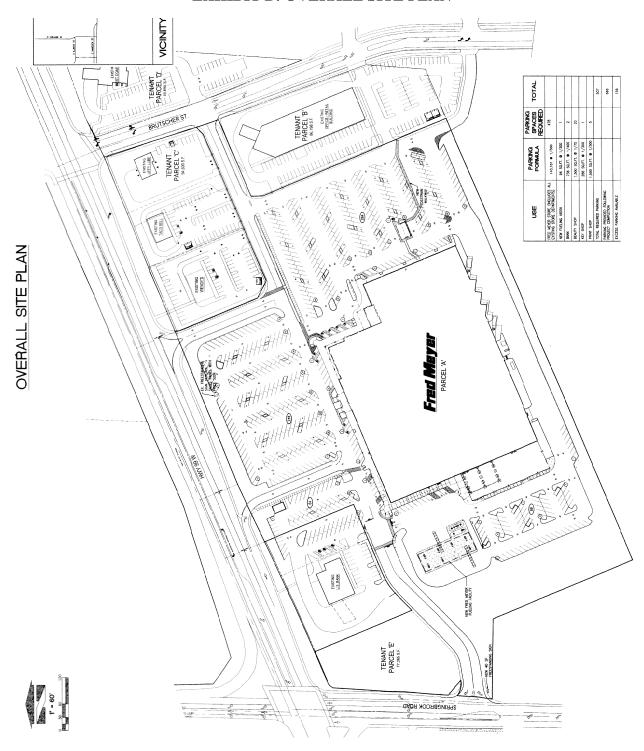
EXHIBIT C: SITE PLAN FOR FUEL FACILITY
